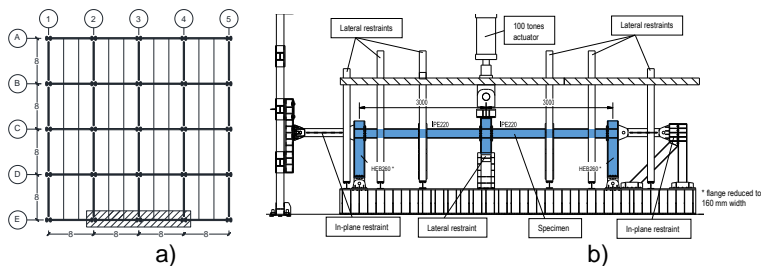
Plan layout of the reference multi-storey building with the position of the specimens extracted for testing (a) and test set-up (b)
